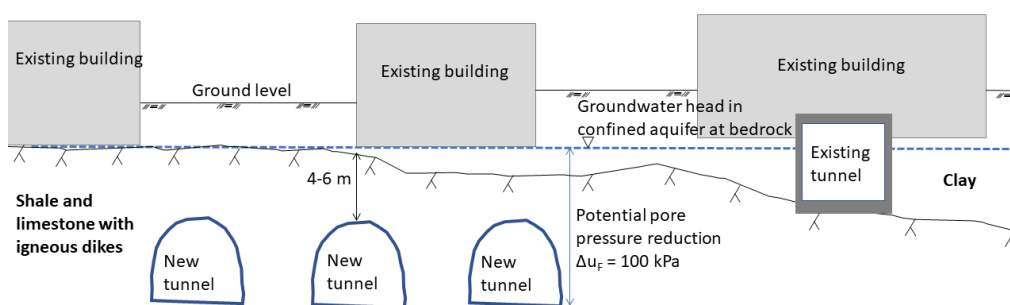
Illustration of new tunnel cross-section with three parallel tunnels and limited bedrock cover.
